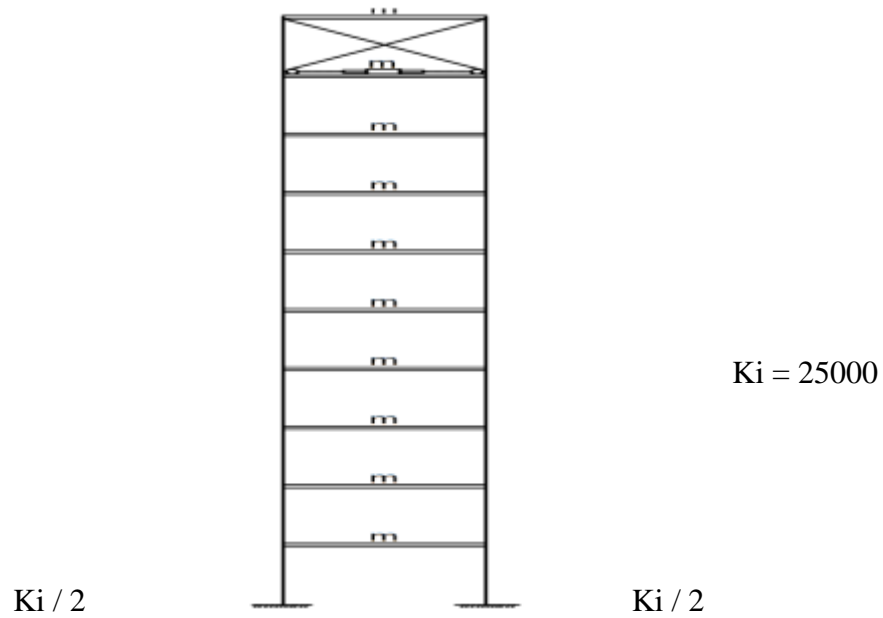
Model of a ten storey building frame with active tendon placed on the top floor
